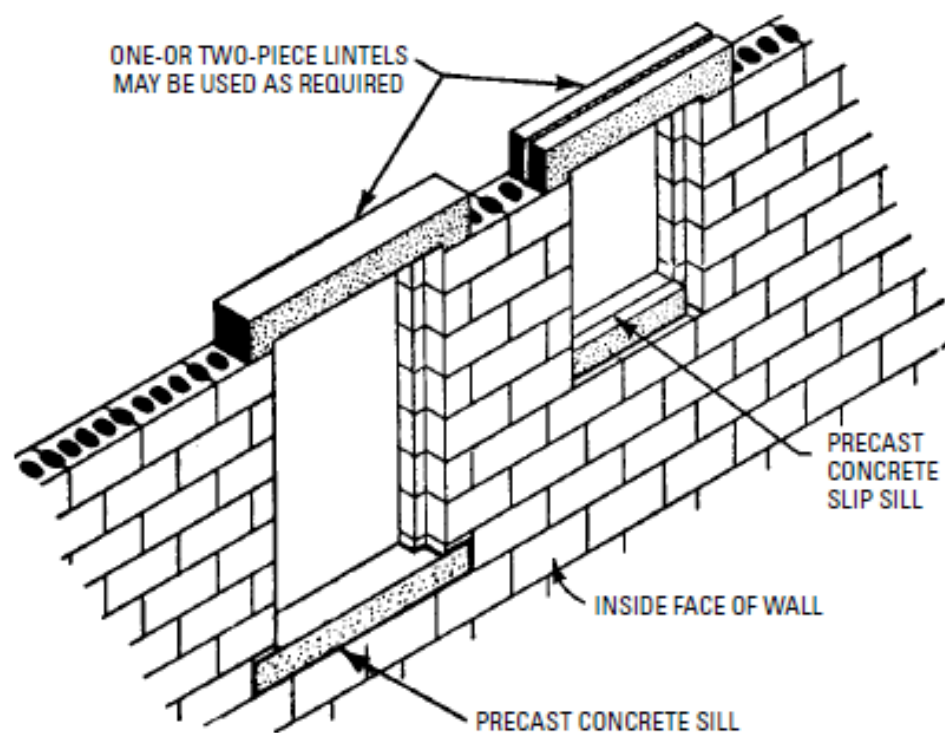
A method of inserting precast concrete lintels and sills in concrete-block wall construction.
